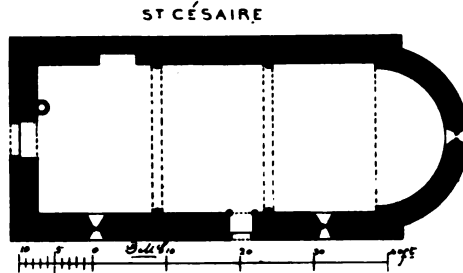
PLAN OF CHURCH, ST CÉSAIRE.
